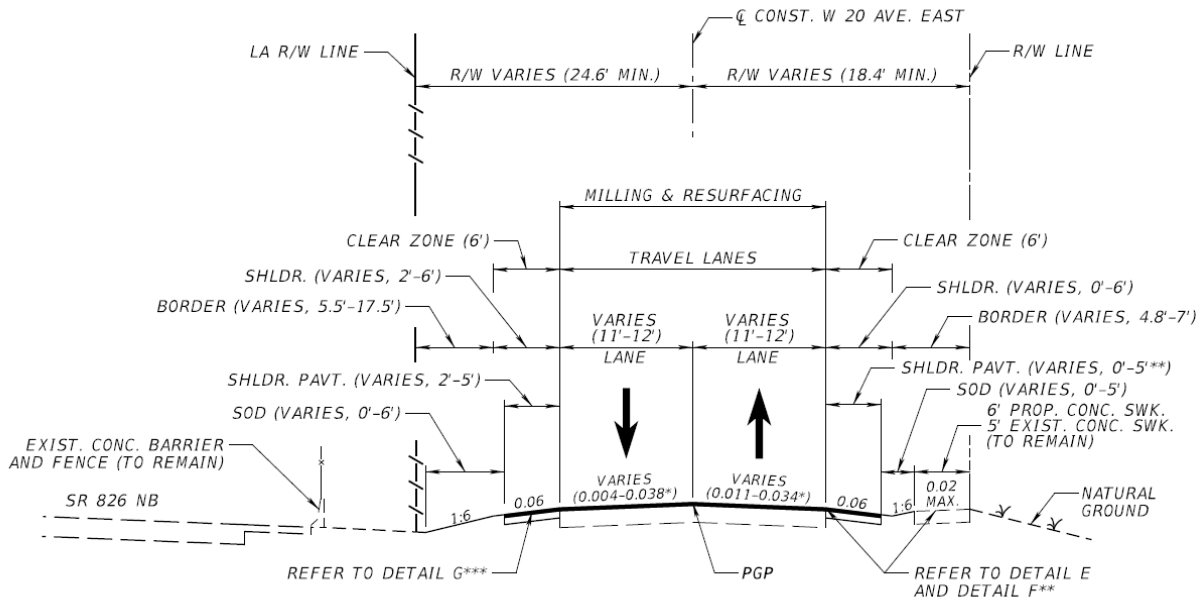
3: Proposed Frontage Road (Undivided)
